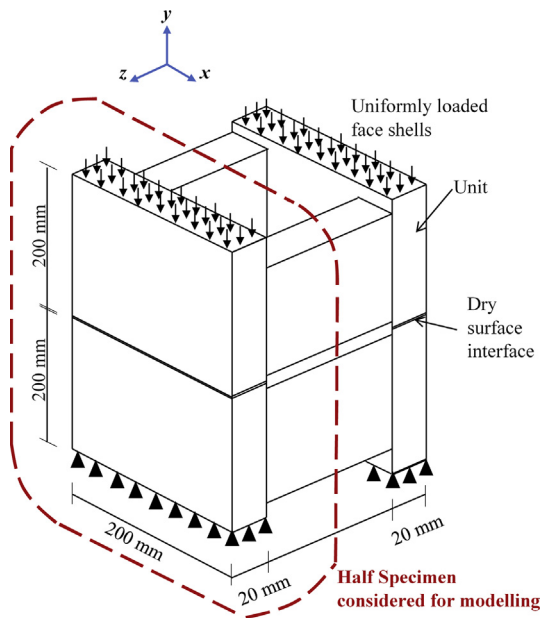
Bi-stacked interlocking blocks prism assembly under compression.
